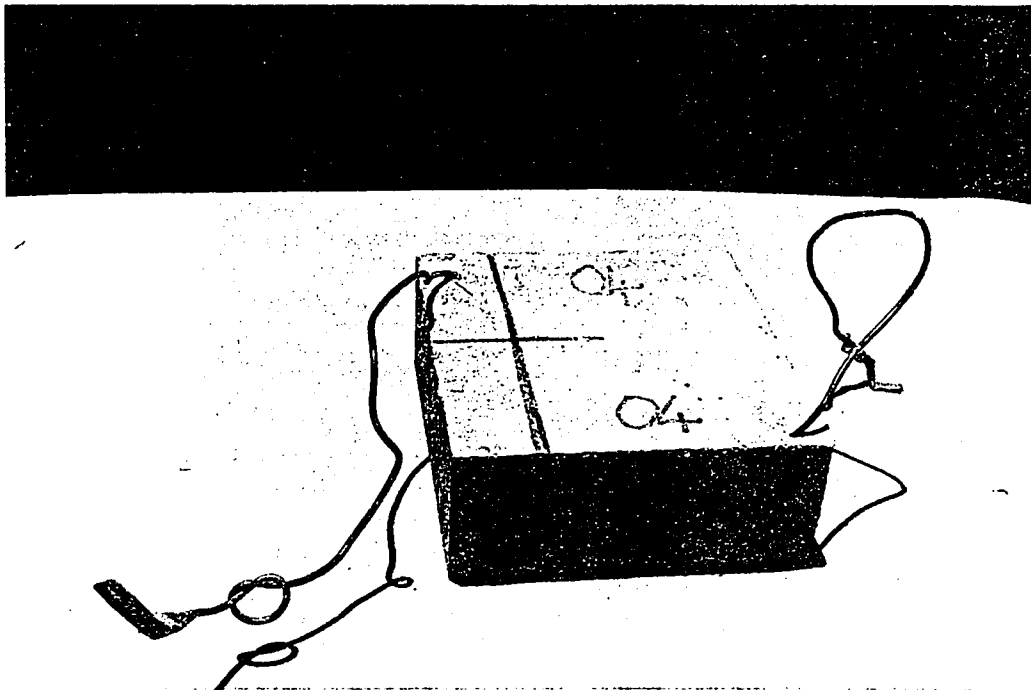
Reinforced Concrete Corrosion Specimen used for Corrosion Monitoring
